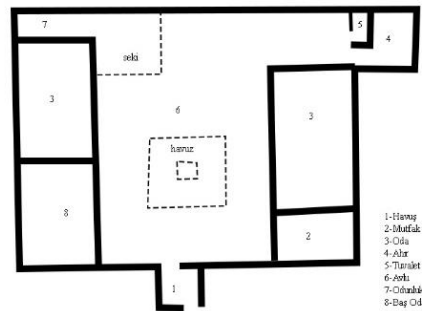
Plan scheme of a traditional Antakya house (redrawn and adapted from Çelebi, 1982) [4]
